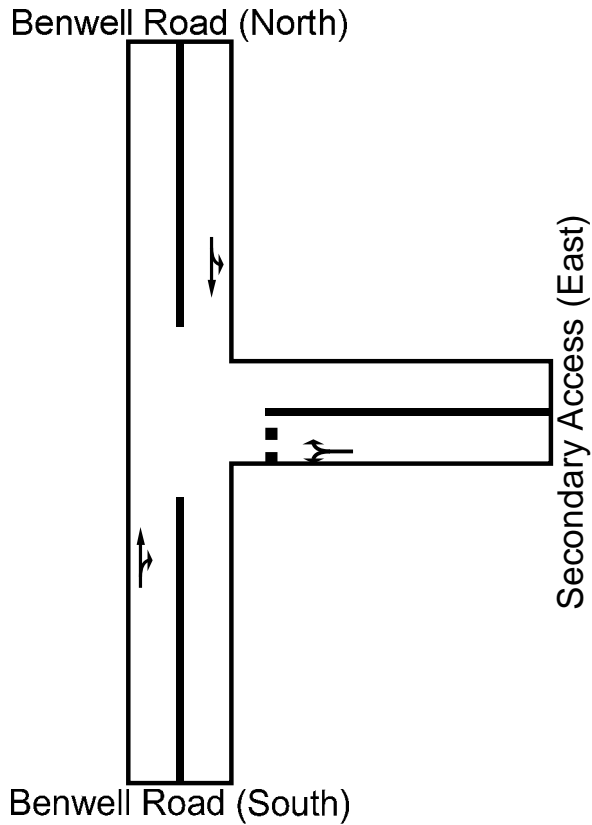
Benwell Road / Secondary Access Intersection Layout - Priority
